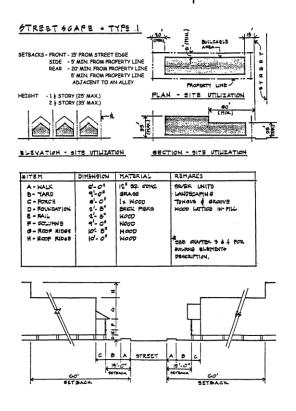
WOOD COTTAGES DISTRICT-STREETSCAPE, TYPE 1
